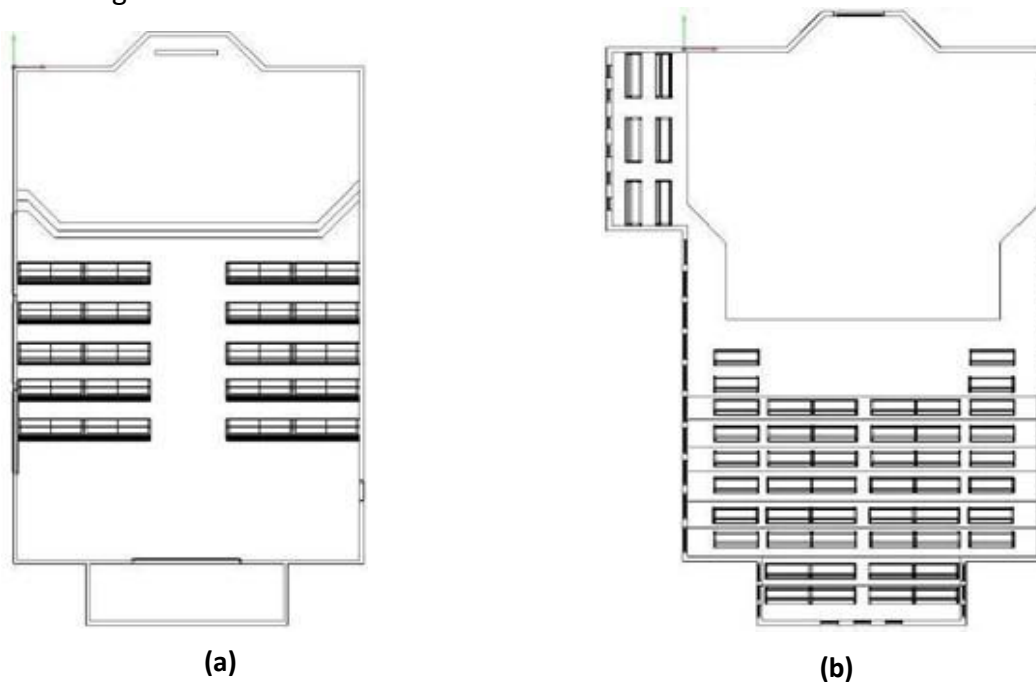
Floor plan of the Javanese Christian Church (GKJ) Bandung (a) first floor; (b) second floor
